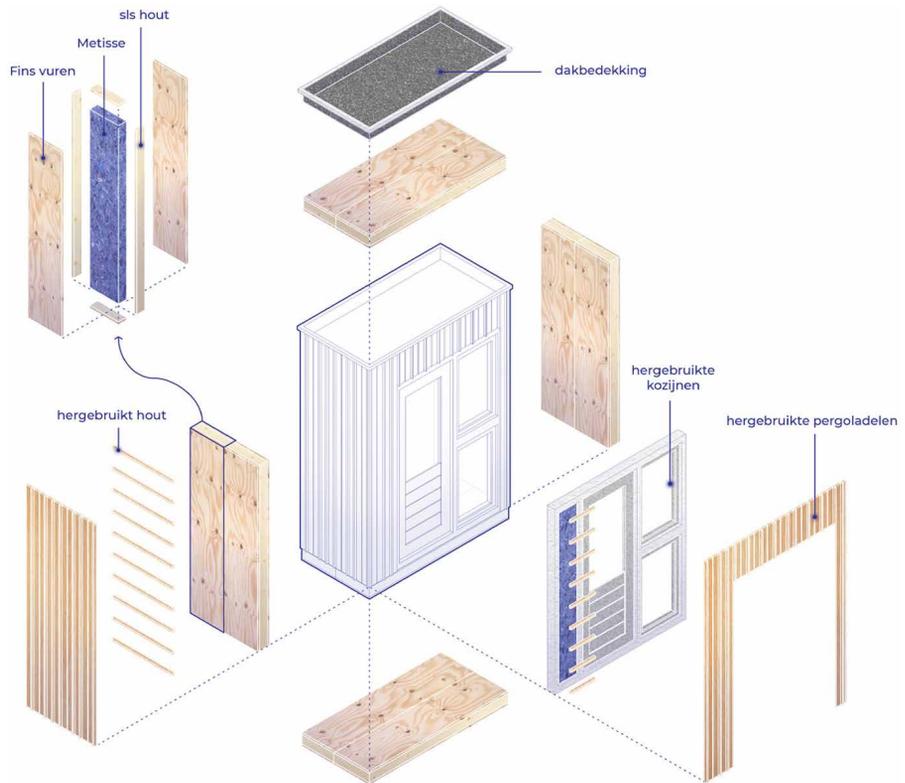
Circular dwelling extension definitive design (image made by DOOR architecten)
